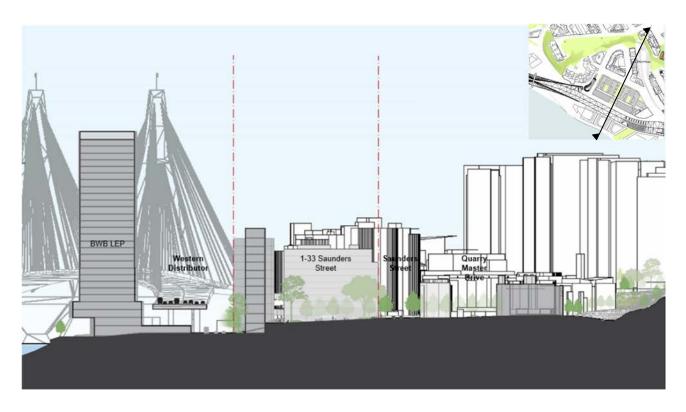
Section of 1-33 Saunders Street and the Blackwattle Bay planning envelopes, looking west
